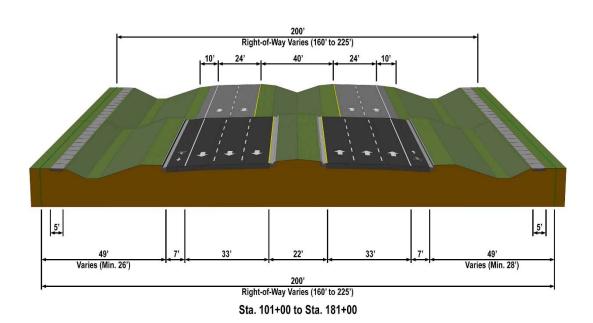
Urban Typical Section – Alternatives 1 and 2
